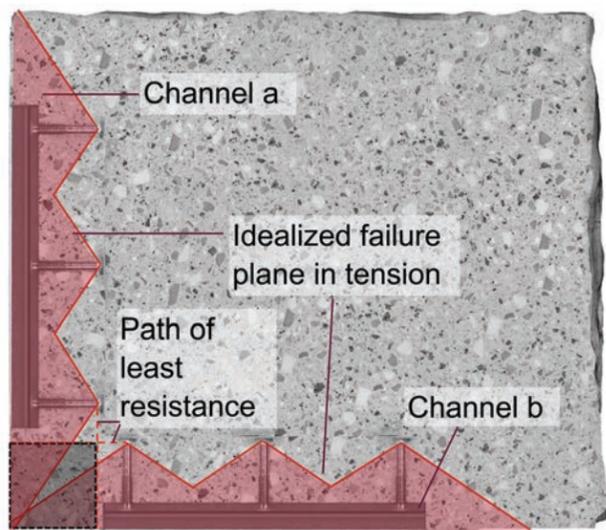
90° corner with anchor channels on both sides – overlapping of tension failure planes.
